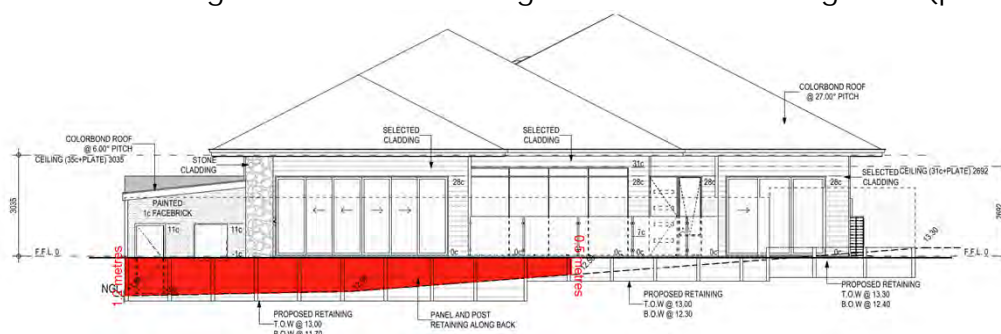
eastern elevation with retaining/infill greater than 0.5m in red.
